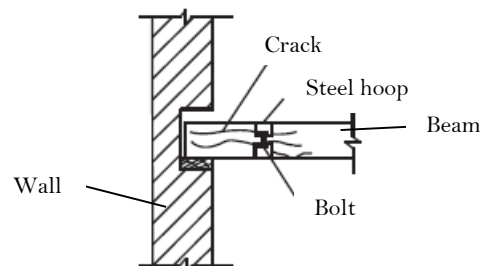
Strengthening with flat steel hoops (Lu, 2010)
